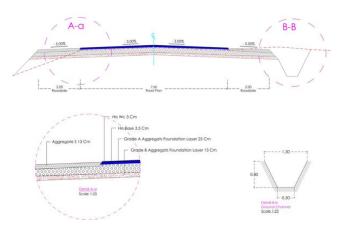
Typical Wamena – Habema – Kenyam – Mumugu Road
